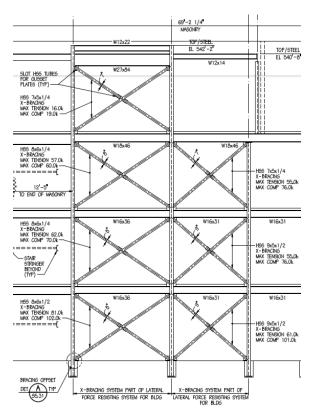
(above): Framing plan including highlights of non moment-frame lateral resisting elements.
